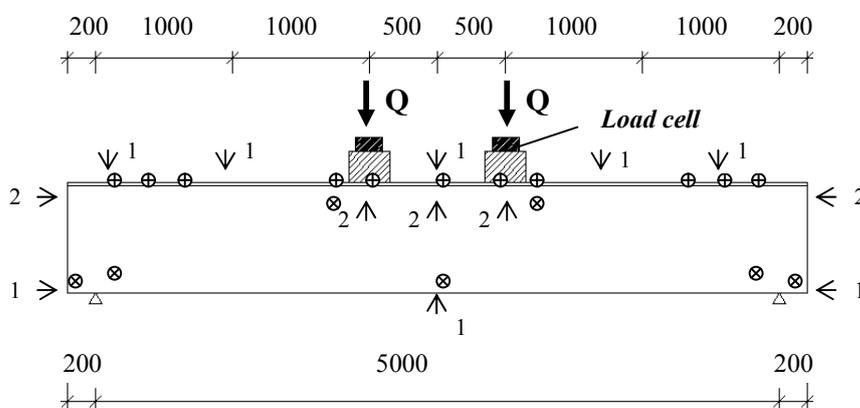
Set-up for the load test. Arrows denote LVDT transducers (number stands for one transducer in centre of beam and two transducers on corresponding sides respectively). Cross denote schematic placement of strain gauges (vertical cross for gauges in the deck and diagonal cross for gauges on the FRP beam).
